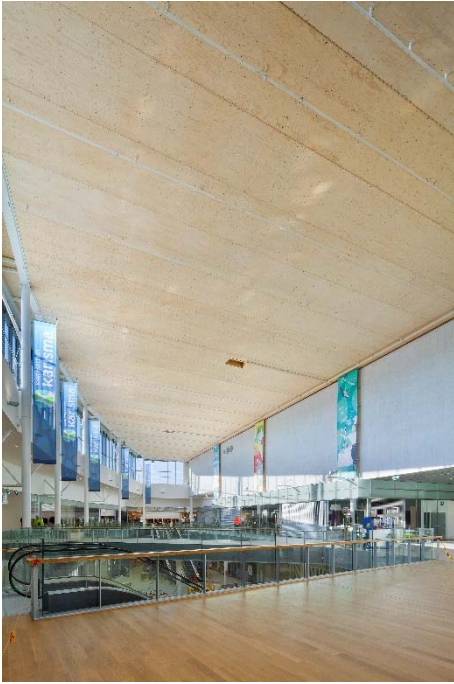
Kerto-Ripa elements in the roof structure of shopping centre.
